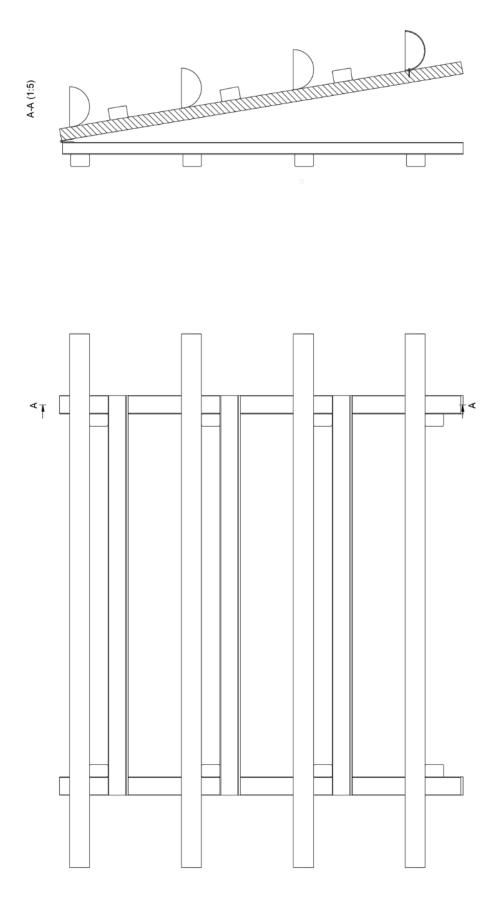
Attaching the rain gutters to the frame in a section detail, technical drawing.
